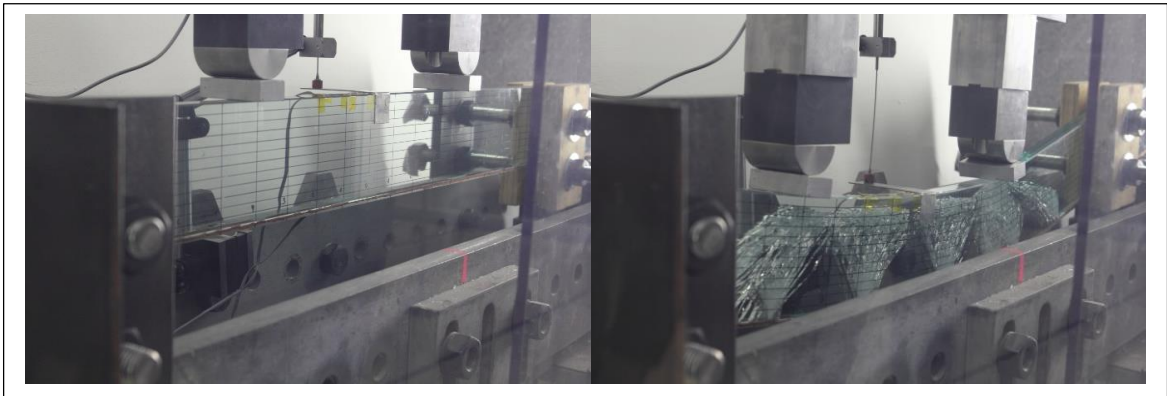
Unloaded beam (left), Loaded Beam (Right)
